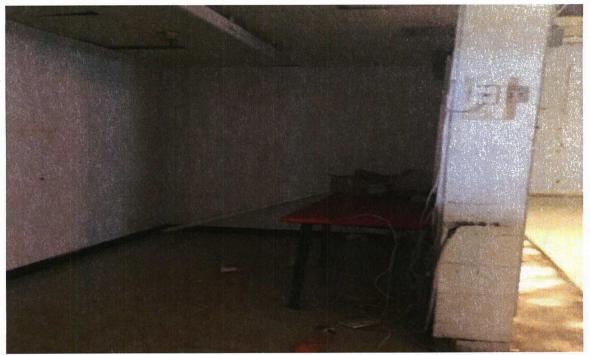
Looking west at the automotive waiting area from the north central portion of the building.
